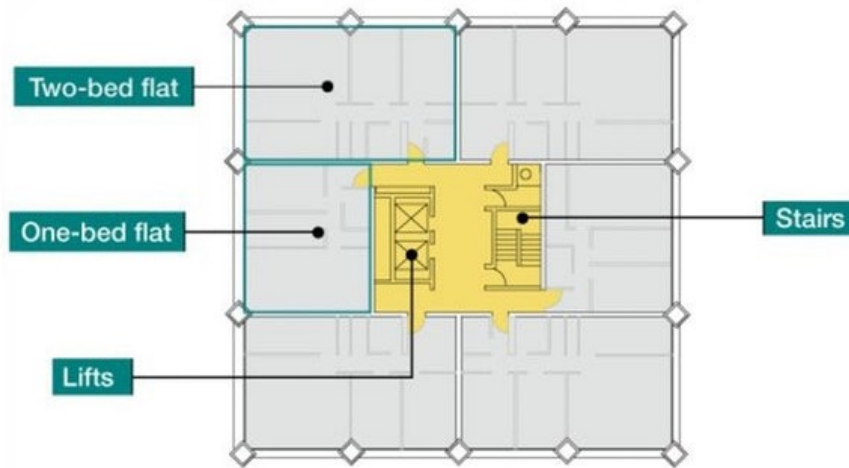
Typical residential floor plan of the Grenfell Tower showing the single exit staircase by Studio E Architects (Morley, 2017)
